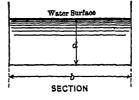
(Part 1 of 3) —Hydraulic Elements of Rectangular Sections
